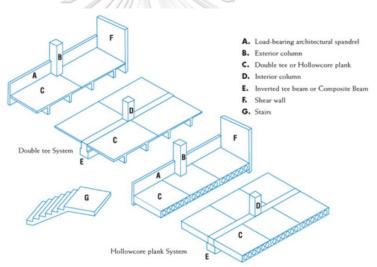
Precast Concrete Components (Source: PCI Mid Atlantic)
